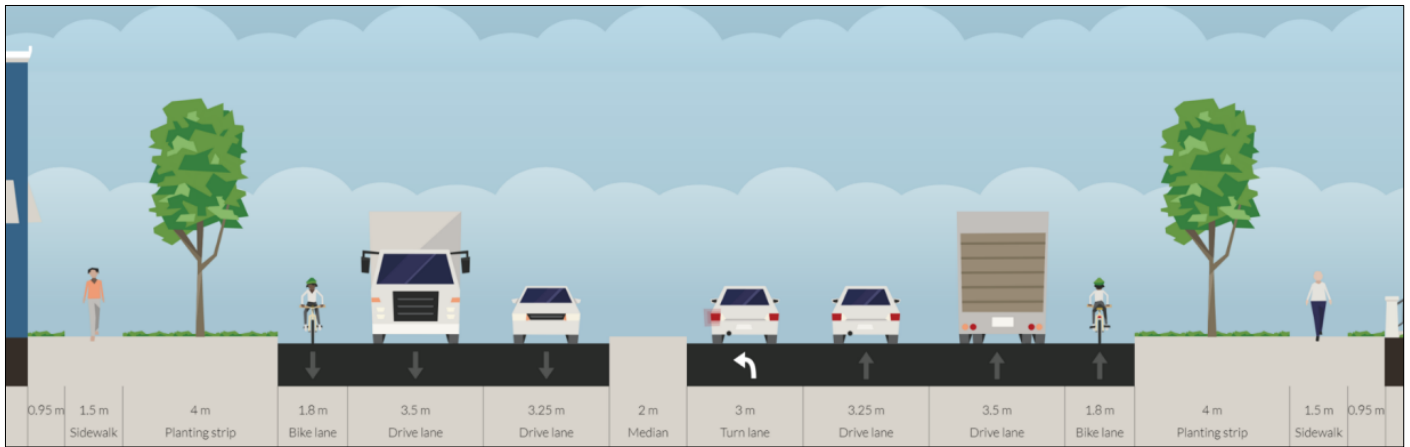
McLaughlin Road Widening Cross-Section (Town of Caledon)
